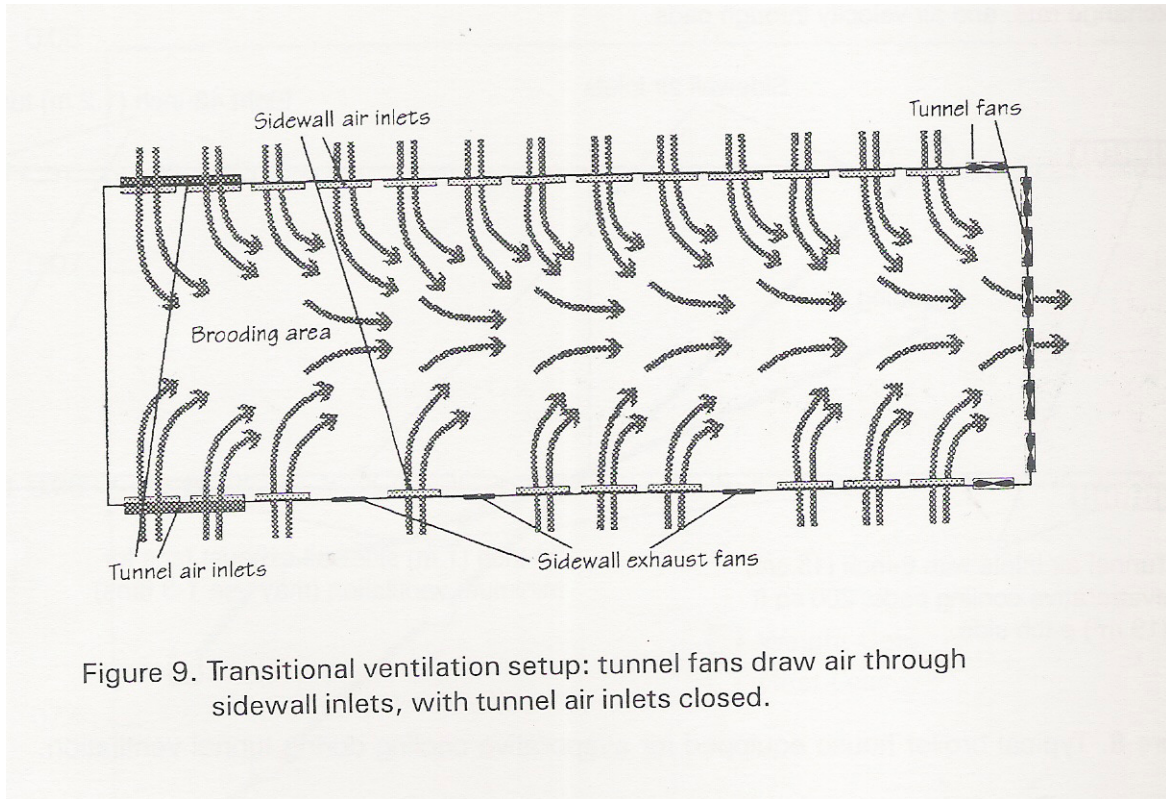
Transitional ventilation setup: tunnel fans draw air through sidewall inlets, with tunnel air inlets closed.
